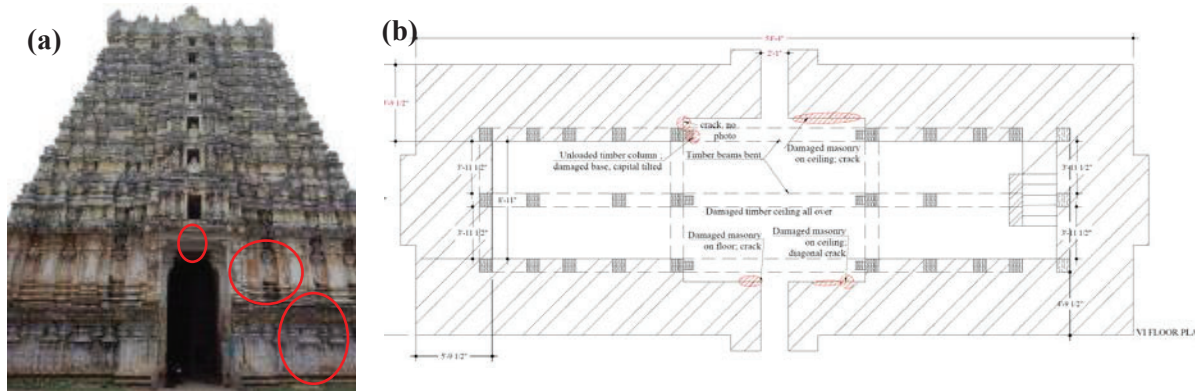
(a) Gopuram front elevation with cracks, and (b) typical upper floor plans
